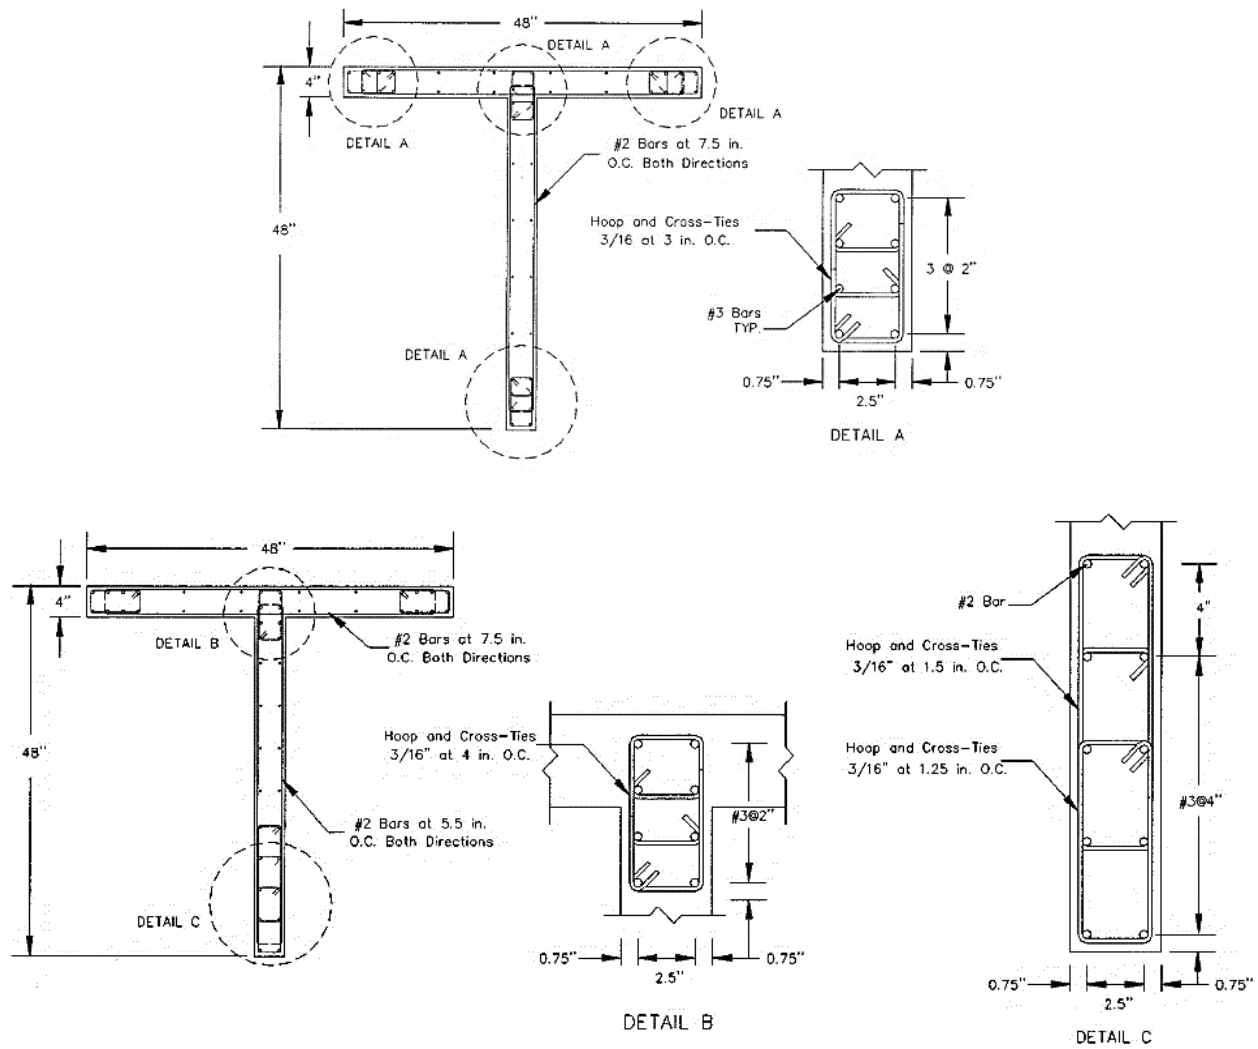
Test Specimen Geometry and Reinforcement Details for Thomsen & Wallace [161]
